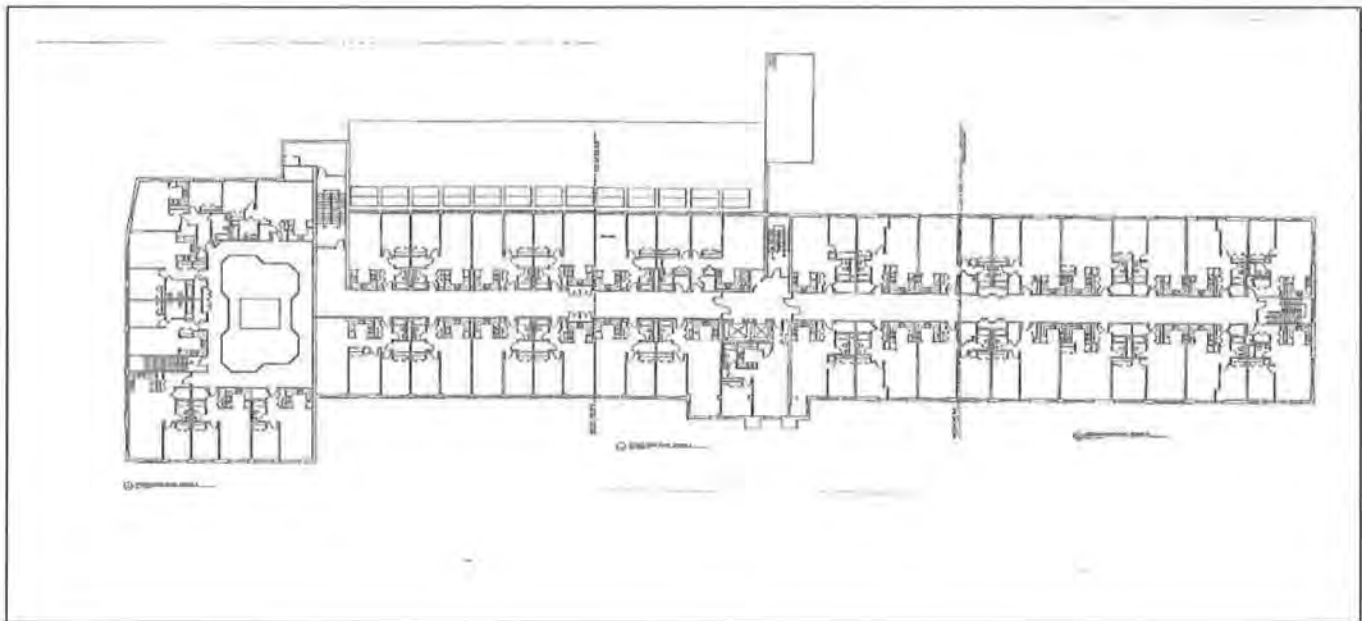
E: Existing Floor Plans – Building 2 First Floor
